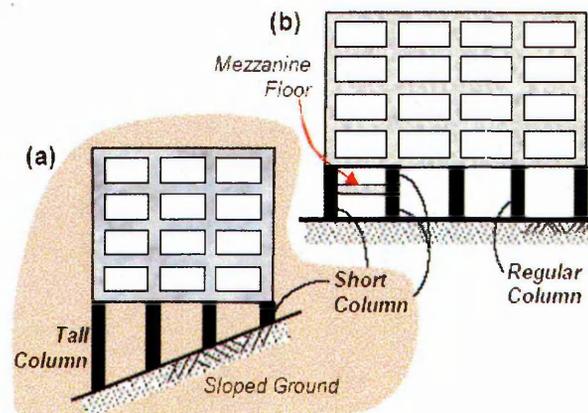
Buildings with short columns – two explicit examples of common occurrences (IITK-BMTPC, 2004)
